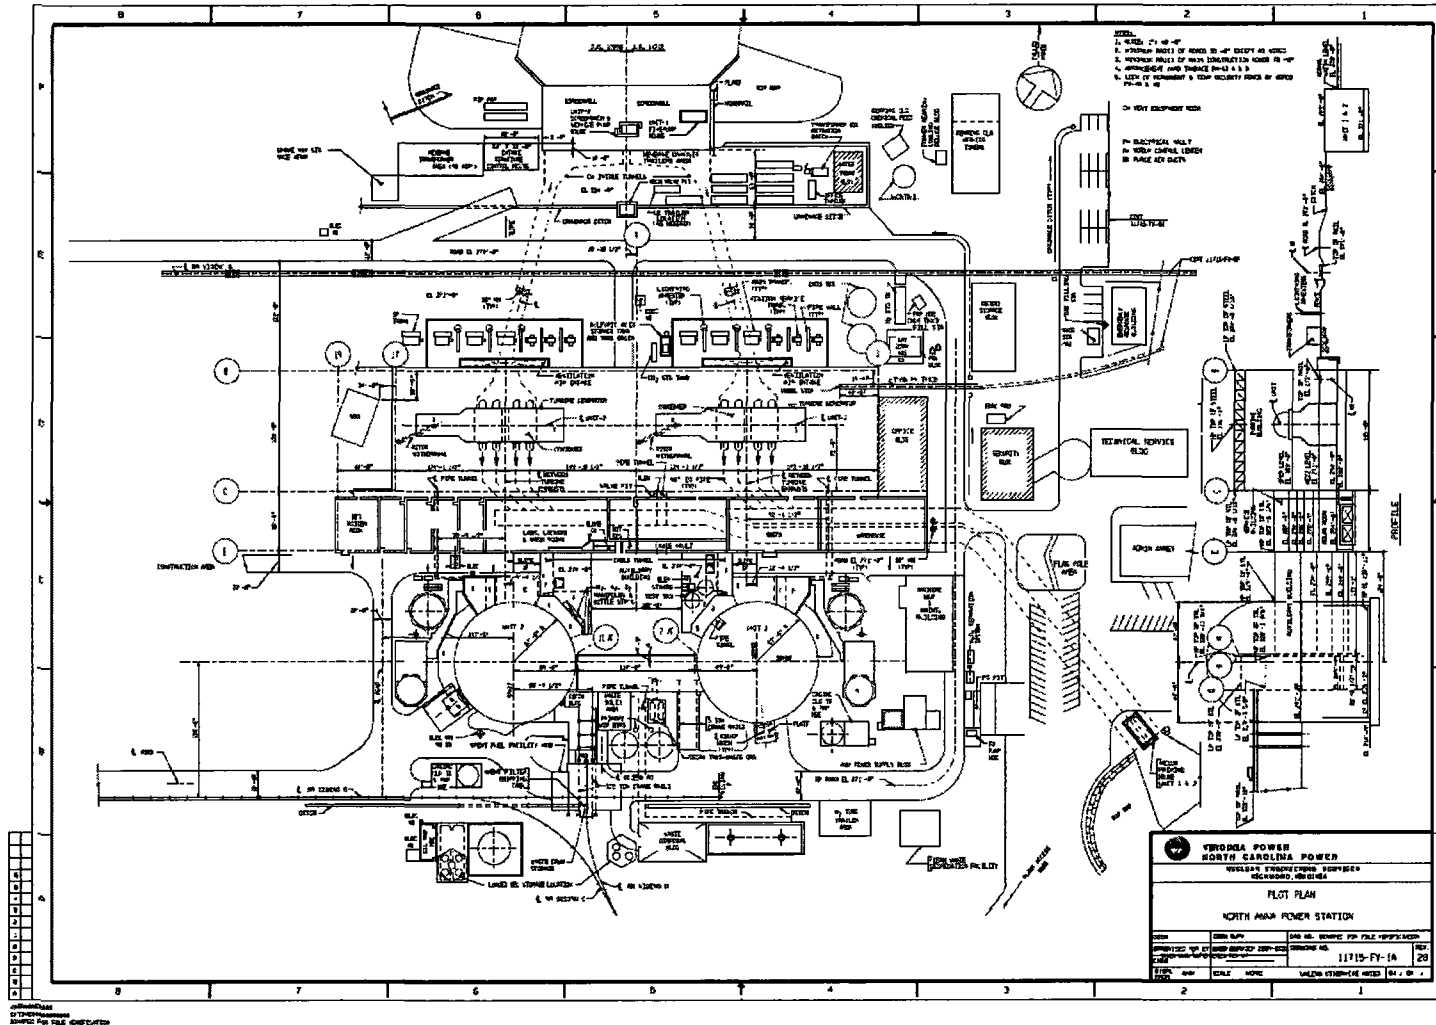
North Anna Power Station Units 1 & 2 Plot Plan
